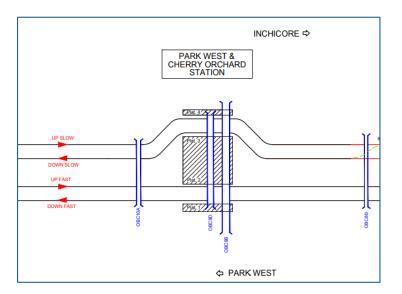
Park West & Cherry Orchard Station – Track Plan Layout
